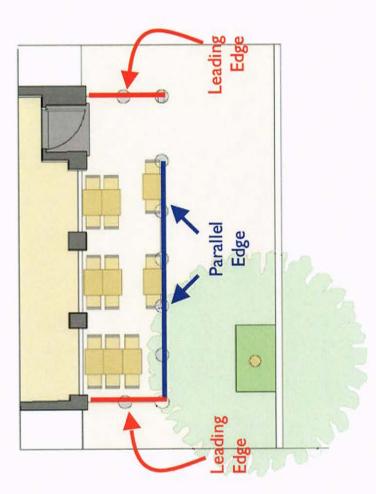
Illustration of leading edge and parallel edge of barrier
